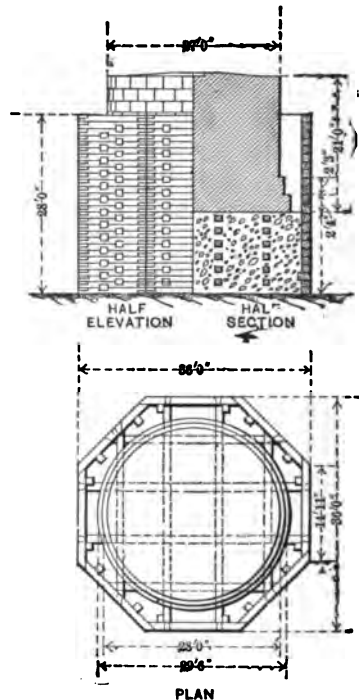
COFFER-DAM FOR PIVOT PIER OF THE COTEAU BRIDGE.
